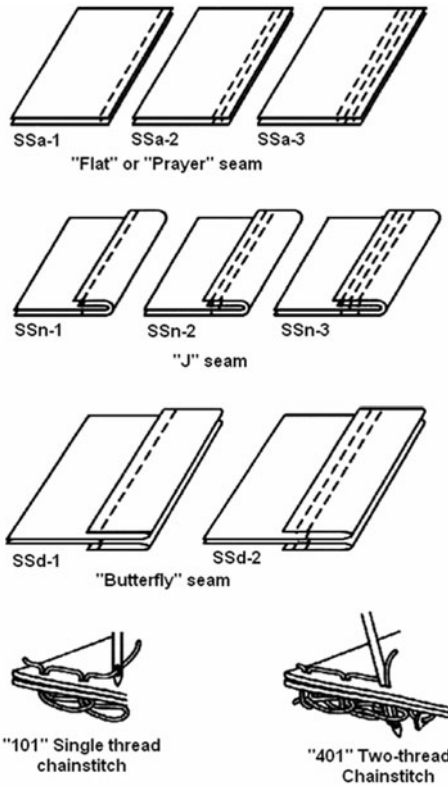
Various Types of Sewn Seams for Joining Geotextiles.
